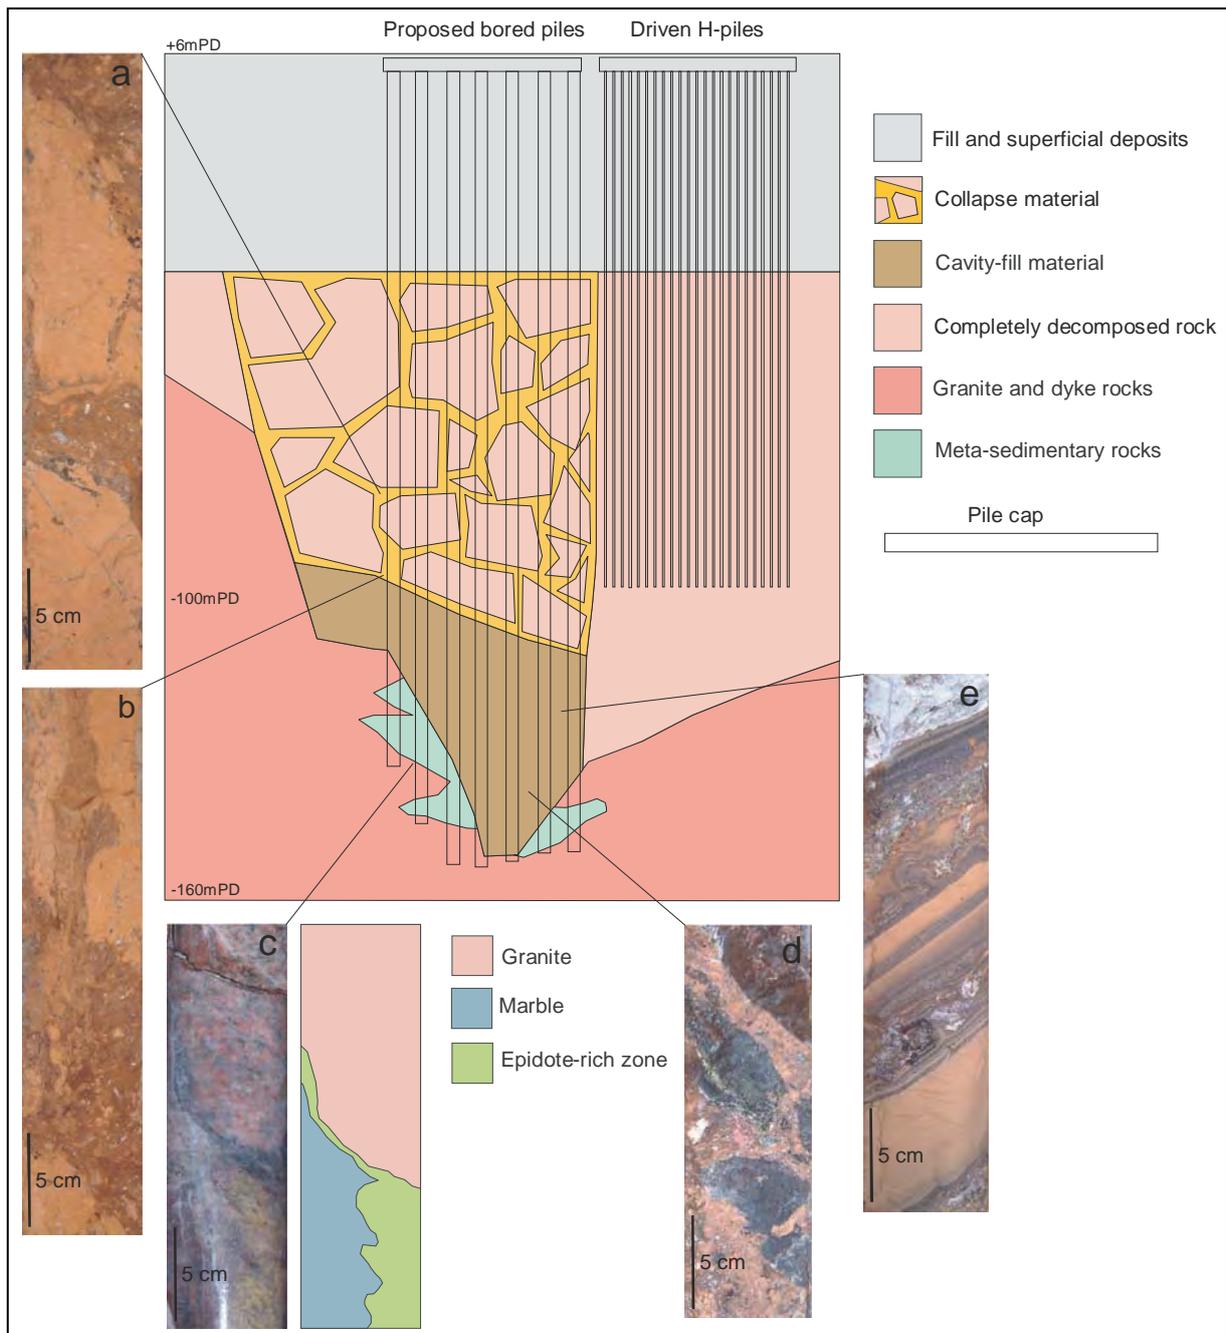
Cross-section of the ground conditions beneath the proposed tower block in Tung Chung (after Fletcher et al., 2000). a. Mazier sample of sedimentary breccia between blocks of completely decomposed feldsparphyric rhyolite. b. Soil pipe in completely decomposed feldsparphyric rhyolite. The pipe extends upwards from a layer of sedimentary breccia. c. Contact between granite and marble with sketch of relationships between rock types. d. Sedimentary breccia within cavity-fill material. e. Finely laminated clay and silt in cavity-fill material
